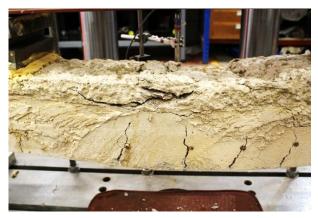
Flexural failure of steel-reinforced beam sample showing distributed cracking and concrete crushing, indicative of safe, ductile failure
